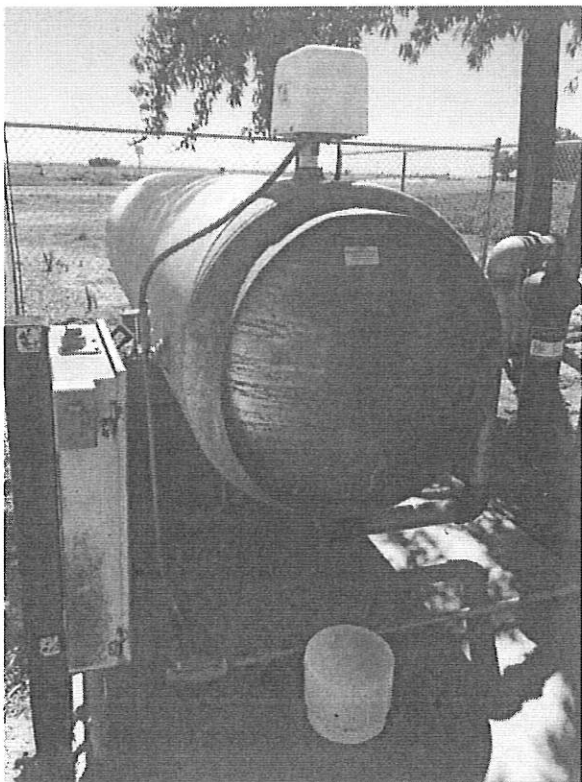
Well No. 2 is located south of the campus, and is on a concrete pedestal that is approximately 4 feet by 4 feet and 4 inches above surrounding ground. The well is secured inside a wooden enclosure.
